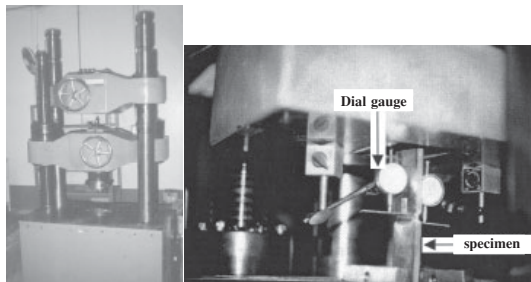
Universal Testing Machine and test set-up for type 1 welded connections specimen.
